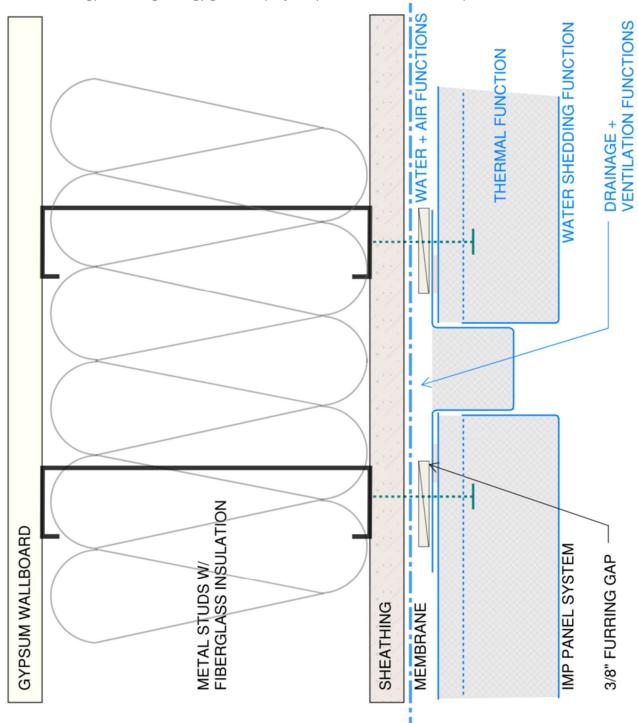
Assembly B – IMP Custom Fit, gap, membrane / sheathing
